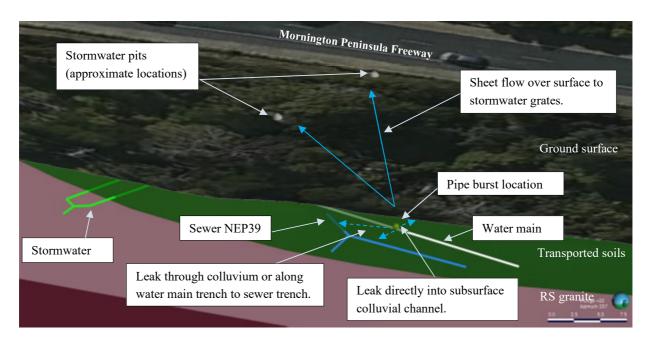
Isometric view showing relationship between pipe burst location, sewer and stormwater trenches and potential flow paths.
